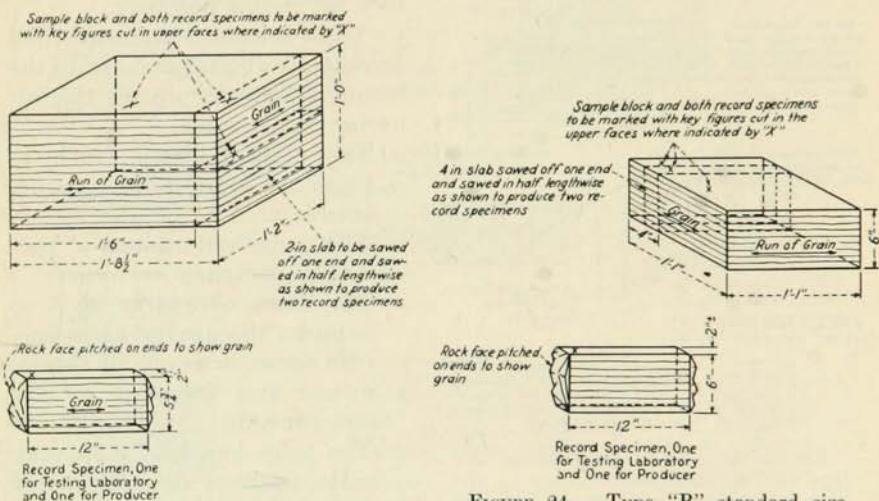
Type "A" standard size sample block for complete series of test specimens and record specimens. After American Society for Testing Materials.
